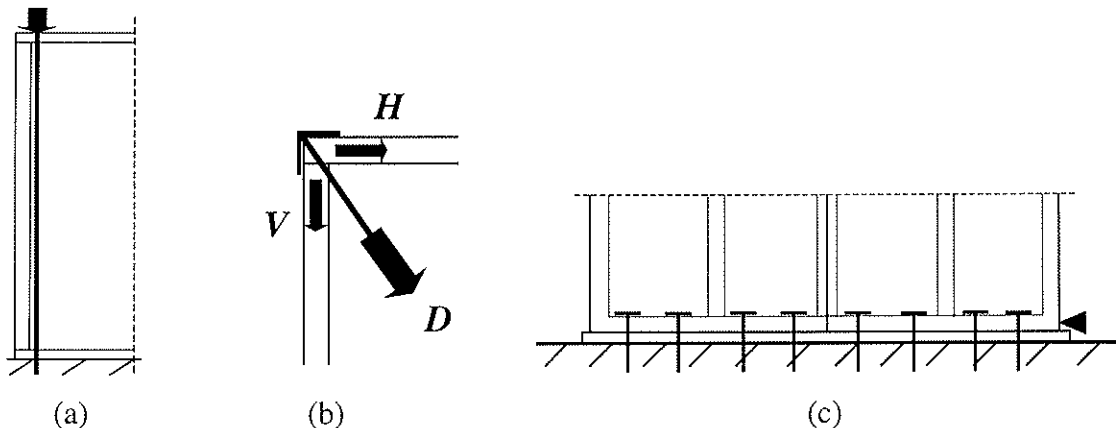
(a) Boundary condition corresponding to full anchoring of leading or tensile stud; (b) Loading condition - diagonal load or its horizontal and vertical components at leading stud and top rail corresponding to a fully anchored leading stud; and (c) Boundary condition corresponding to bottom rail continuously anchored to the rigid foundation;
